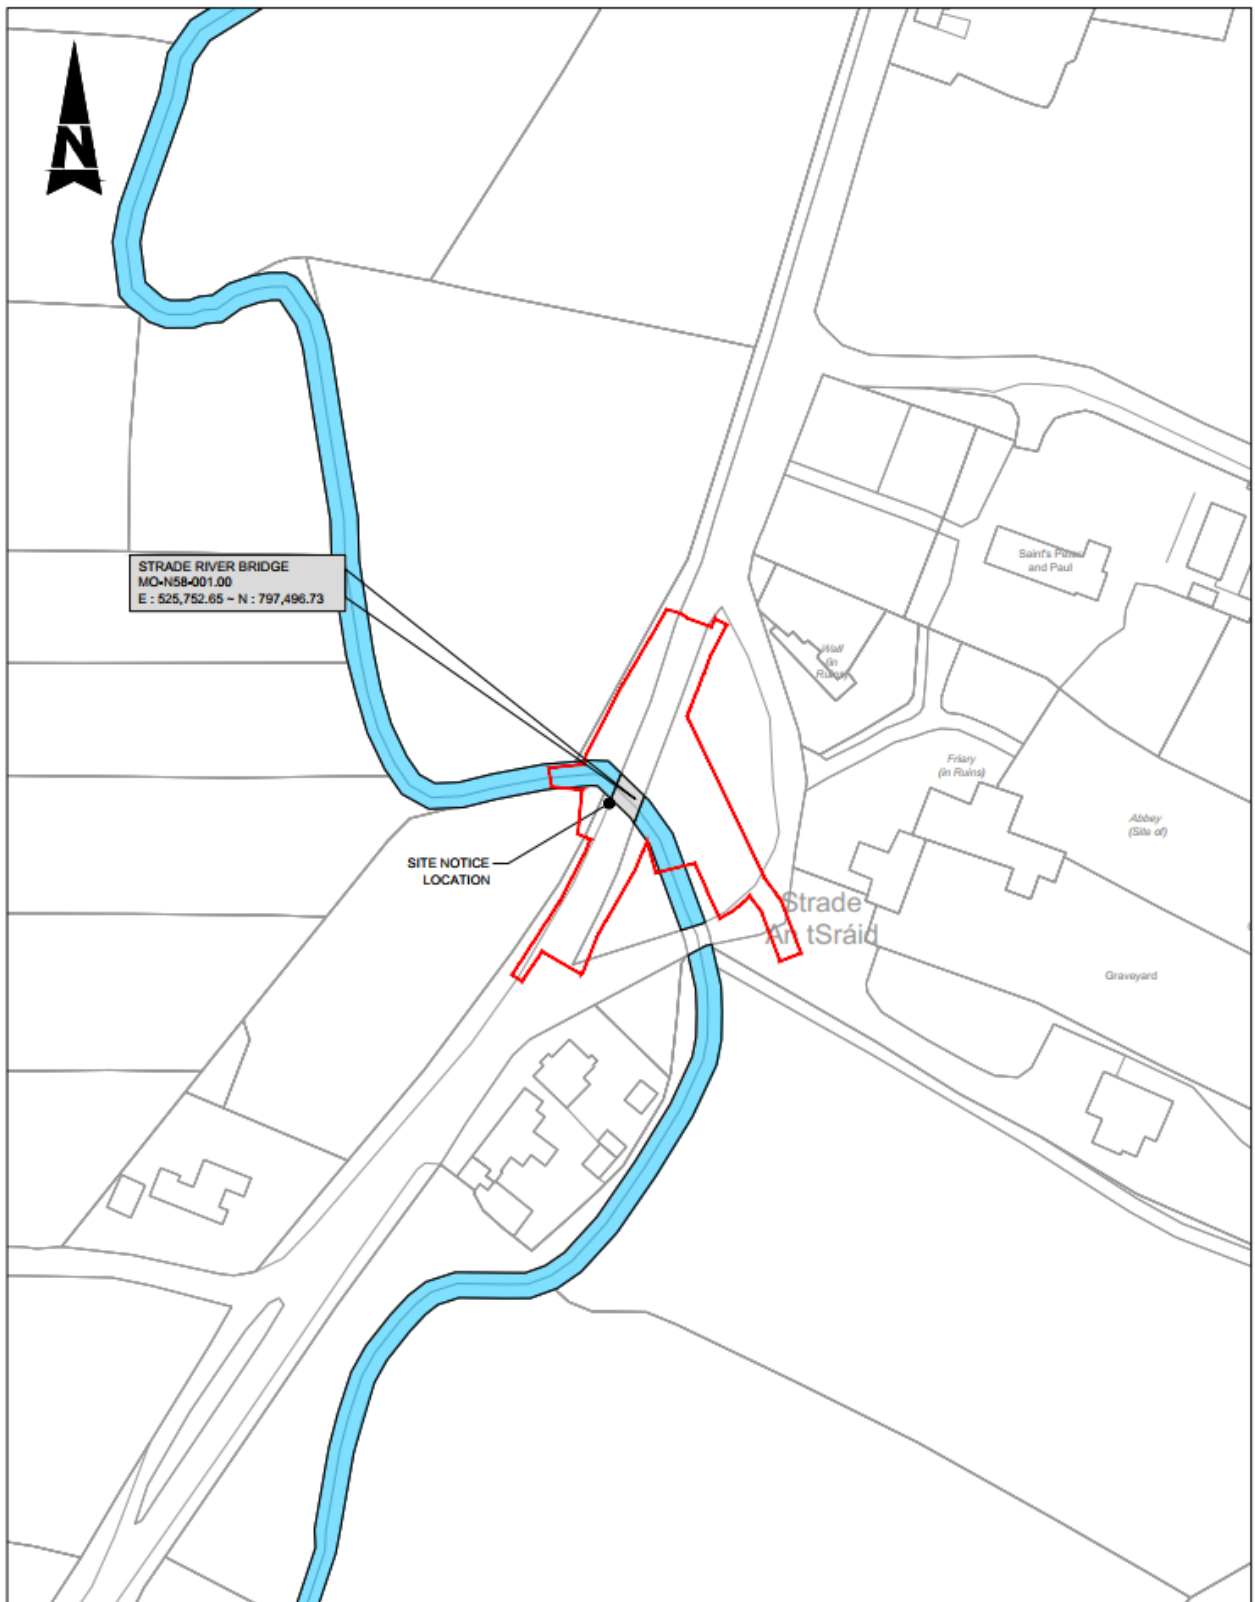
Extent of Proposed Development Site (Red Line)
